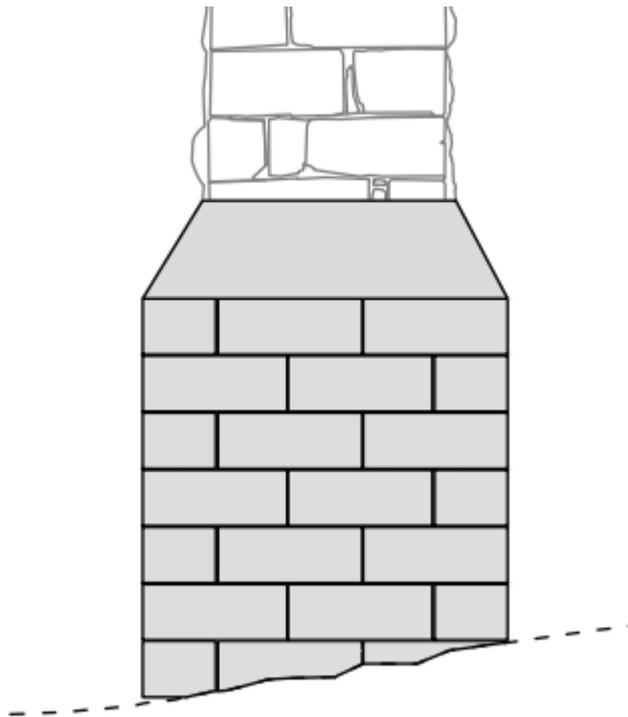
Elevation showing 'Running bond' pattern proposed for 'Pier Jacketing wall' at shorter face
